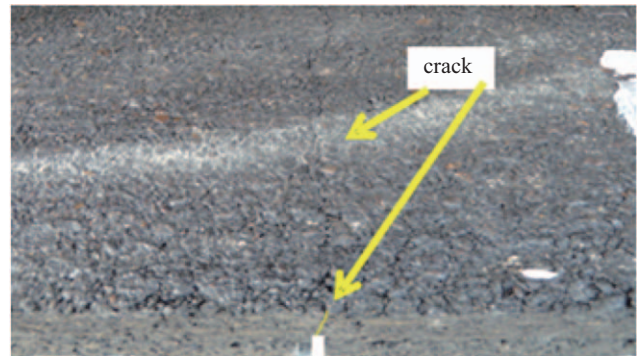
Failure caused by vertical crack propagation (slab 1 without reinforcement).
